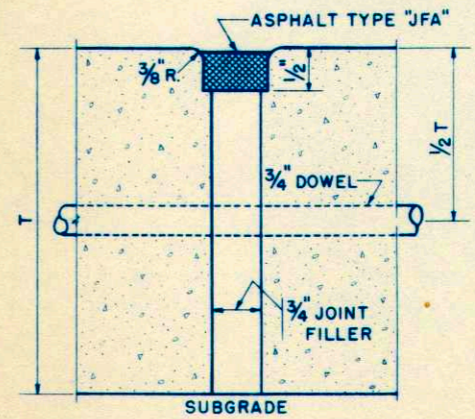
DETAIL SHOWING LAYOUT OF TRANSVERSE CONTRACTION JOINTS
